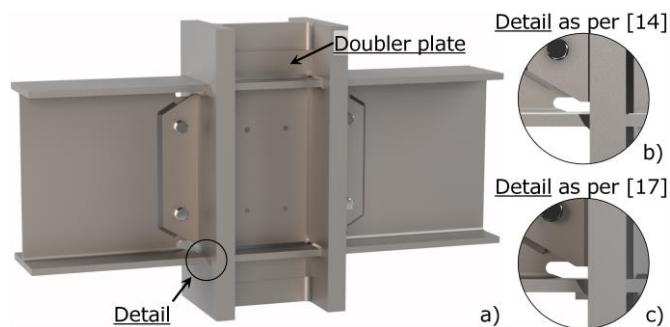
a) Typical welded unreinforced-flange welded web beam-to-column connection, and b-c) beam flange-to-column face welded detail according to AISC [14] and Skiadopoulos and Lignos [17], respectively
